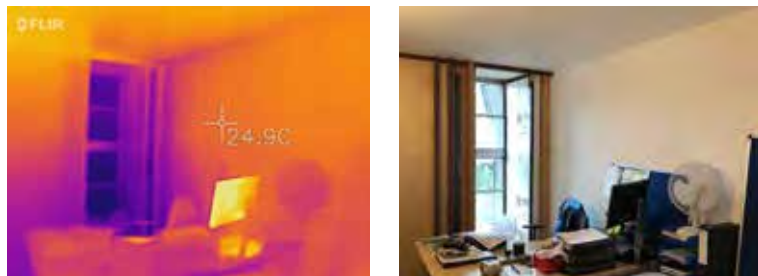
Image of the bedroom in same A3 void unit at mezzanine level showing the unheated wall 14°C cooler than the heated coil wall in figure 13.
